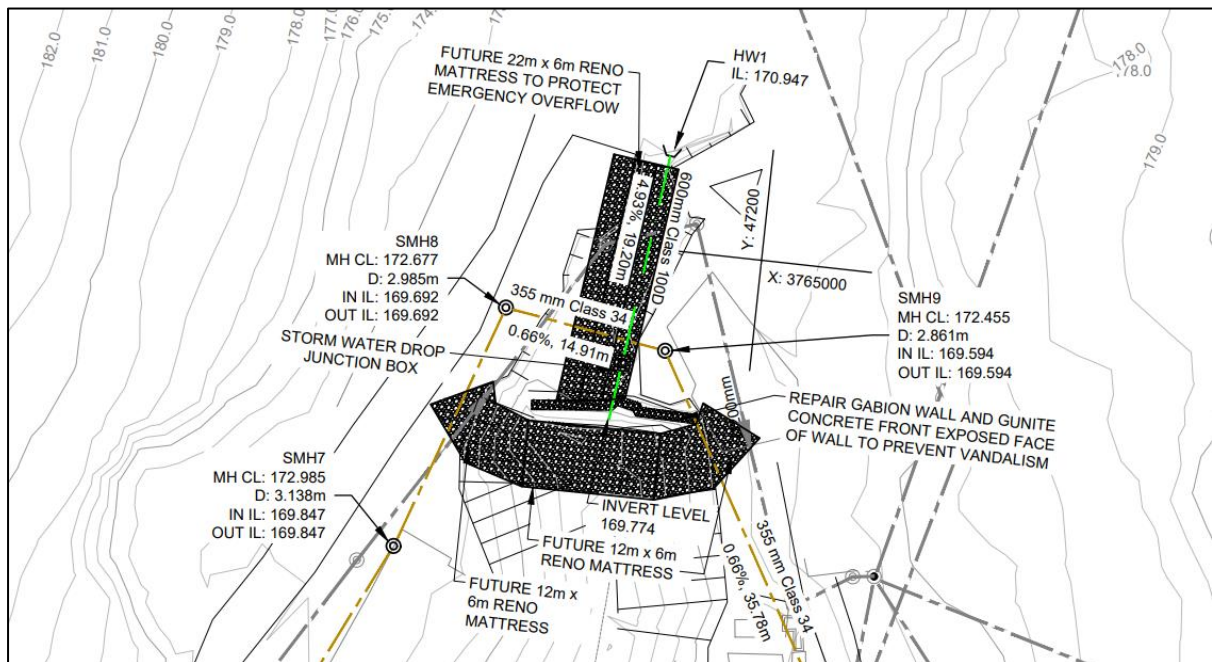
Newly constructed gabion wall. Reno mattresses proposed at the foot of the gabion wall to prevent erosion from plunging water in the stream bed. Reno mattress proposed above the gabion wall to prevent erosion caused by blocked stormwater pipelines causing water to flow over the face of the gabion wall.
